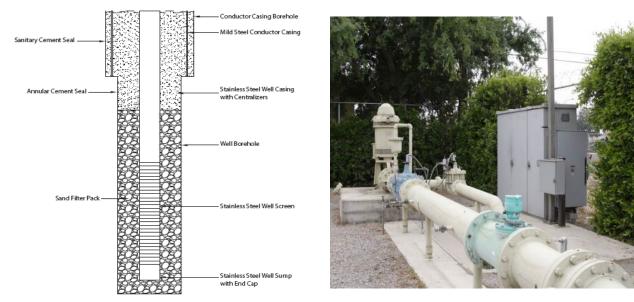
Typical Extraction Well Section Figure 3.2.5-5 Wellhead of Typical Extraction Well
